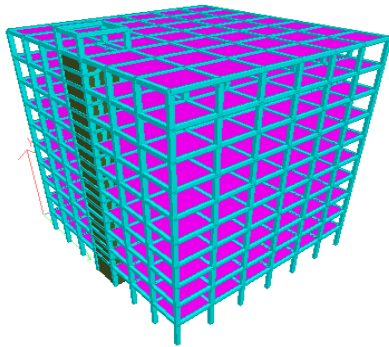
D VIEW OF CONVENTIONAL SLAB WITHOUT SHEAR WALL.
